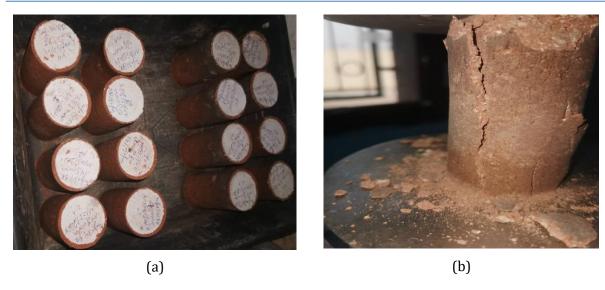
(a) Samples for different durations: 3, 7, 14, and 28 days and (b) The crushing of the test pieces
